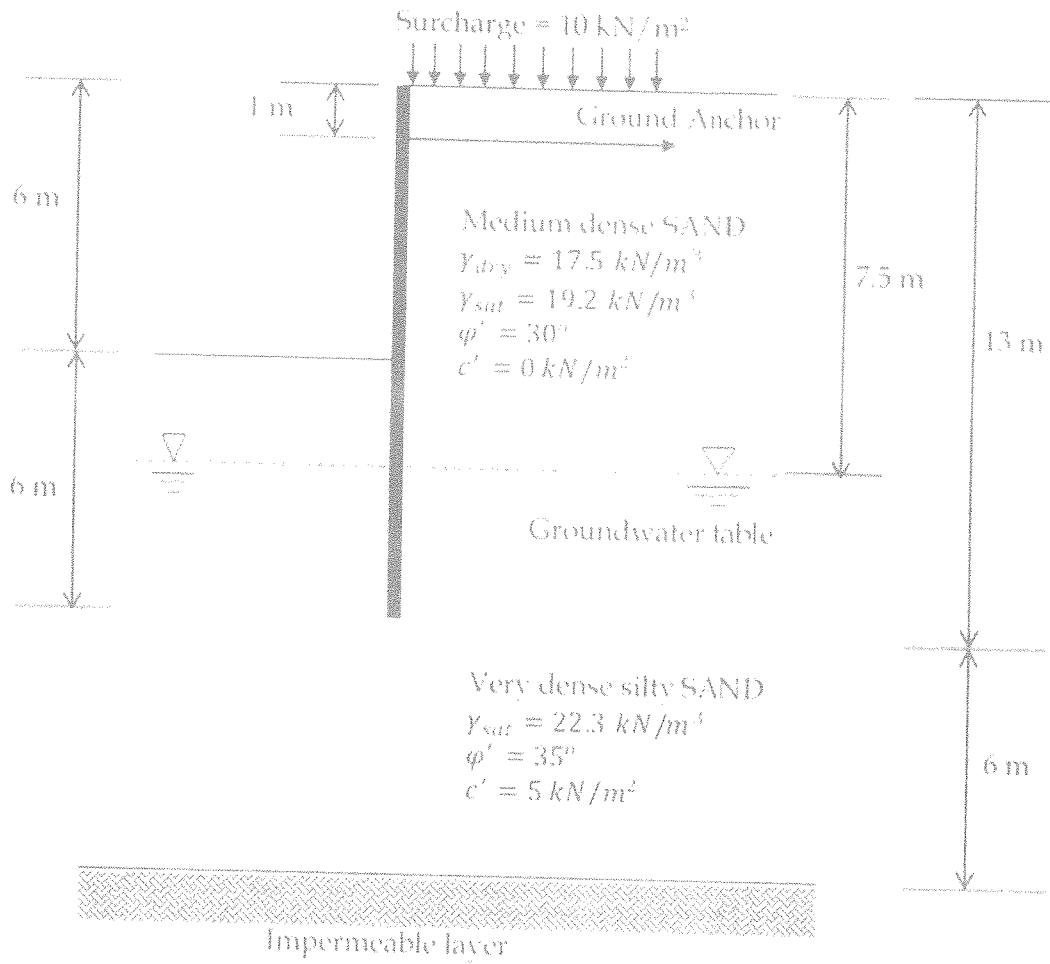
Proposed anchored sheet pile wall arrangement
